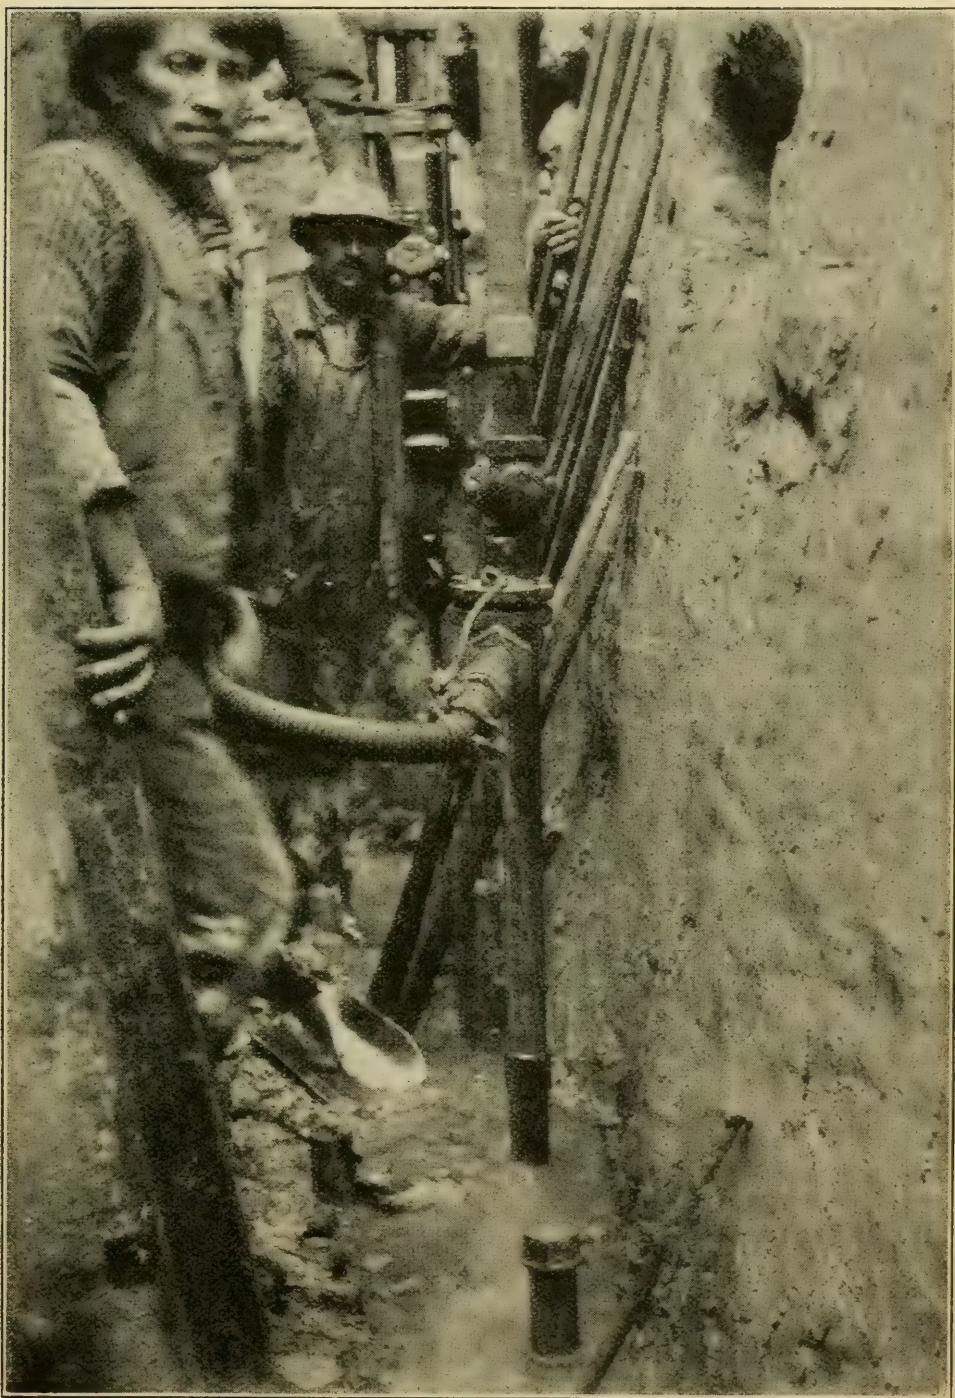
METHOD OF GROUTING UNDERLYING SEAMS IN CORE-WALL DITCH. GROUTED HOLE WITH CAP, IN FOREGROUND. CEMENT PLASTER ON SIDE-WALLS OF DITCH.
